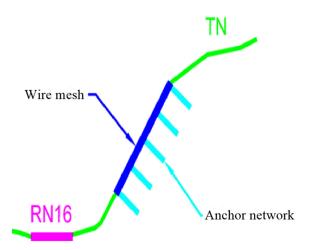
Typical cross-section for solution 6 (cliff reinforcement)
